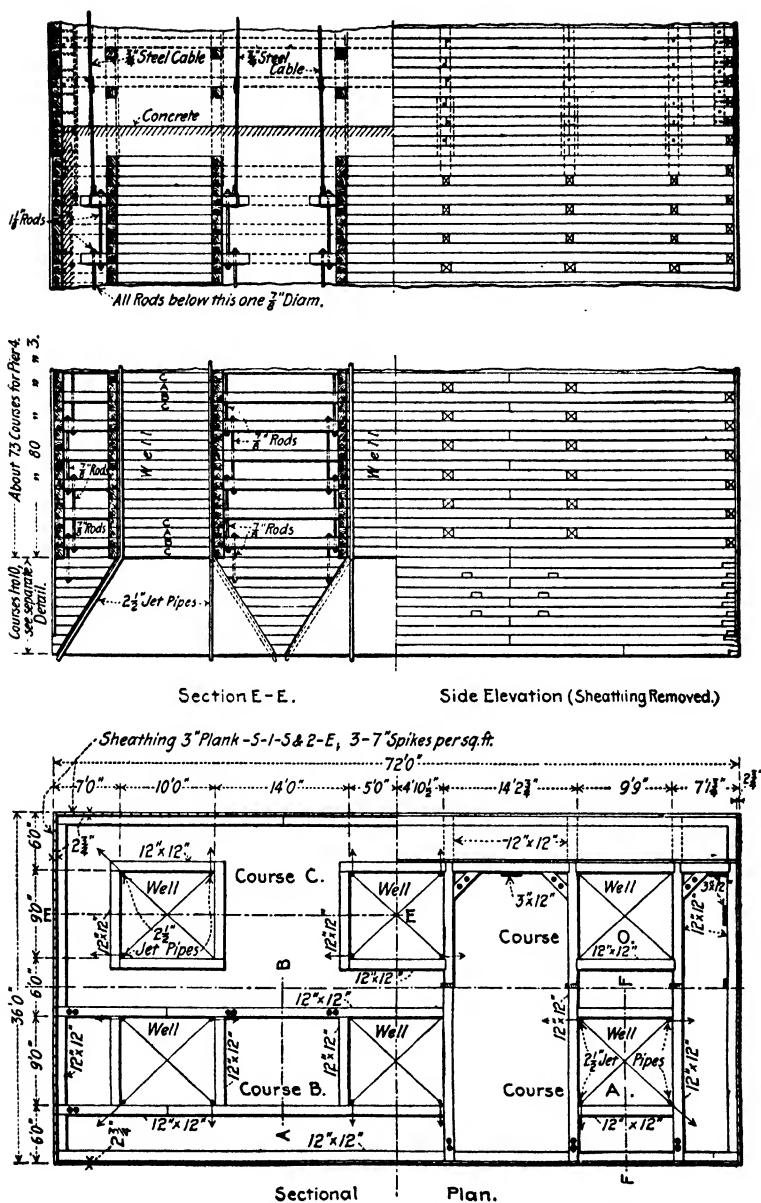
Open Caisson and Cofferdam for the Oregon-Washington Railroad and Navigation Company's Bridge at Portland, Ore.
